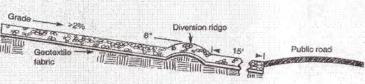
Cross-section of a Construction Entrance/Exit (NC, 1993)
